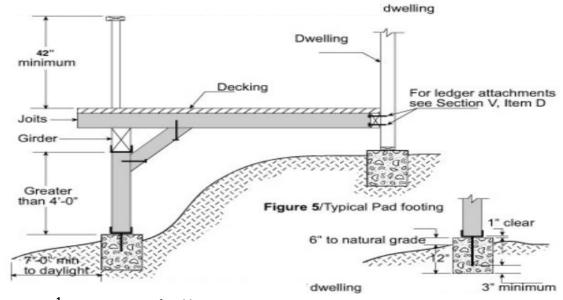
TYPICAL DECK ELEVATION LOOKING PARALLEL TO REAR OF DWELLING
